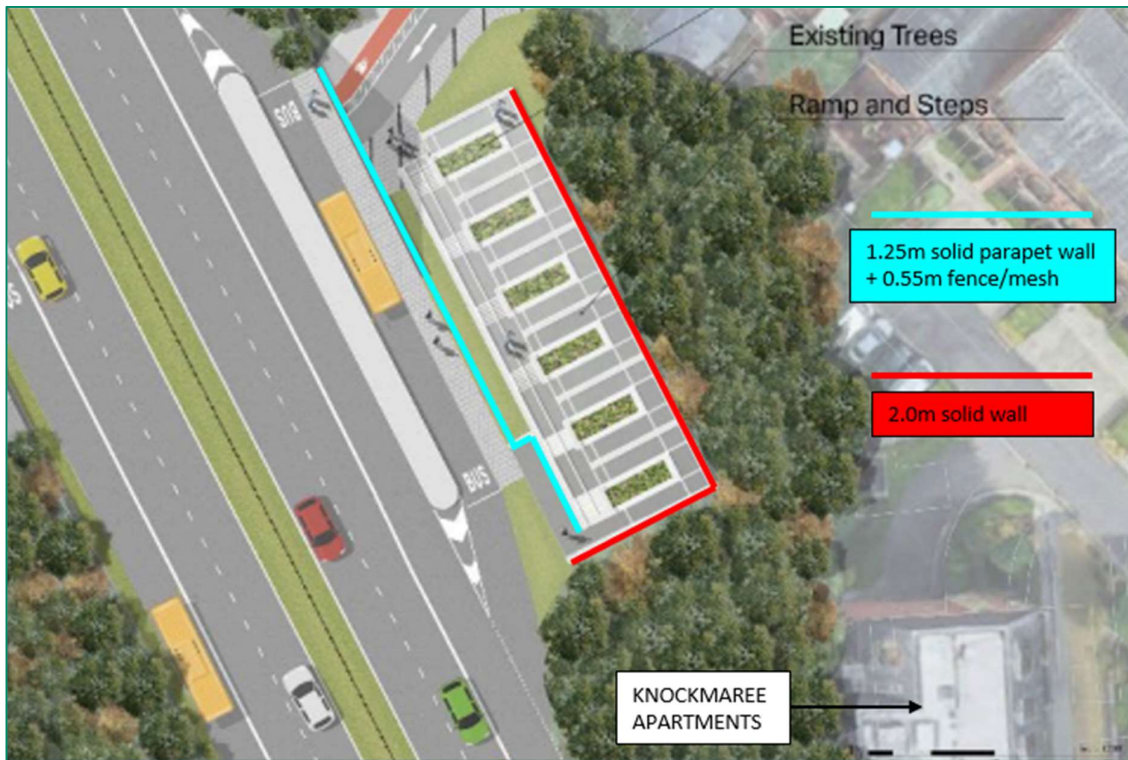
Proposed Walls Adjacent to Knockmaree Apartments
